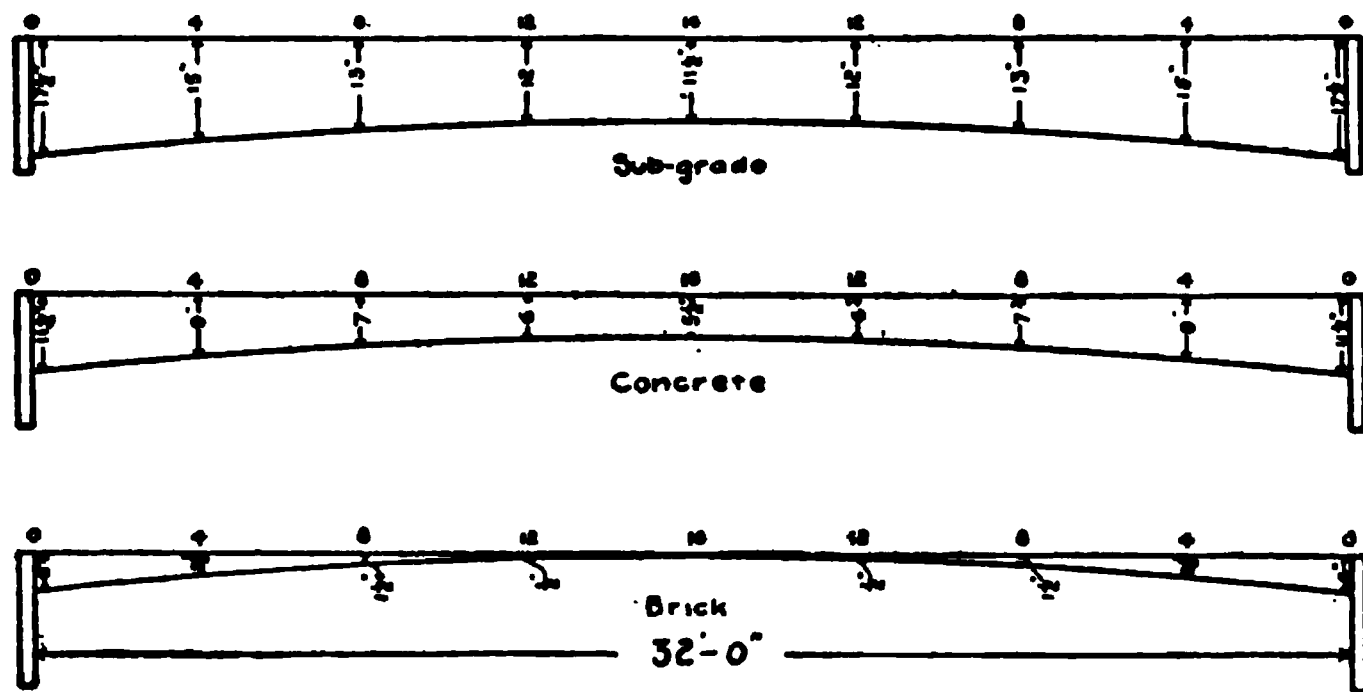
METHOD OF SHOWING CROWN OF PAVEMENT.
